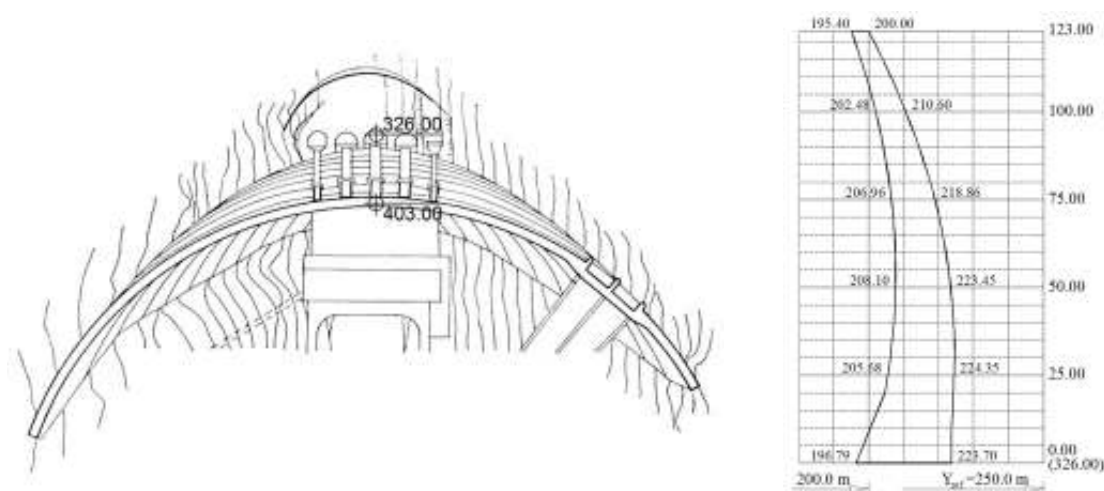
Plan of the dam's body with land topology (left) and cross section through central cantilever (right) [15]
